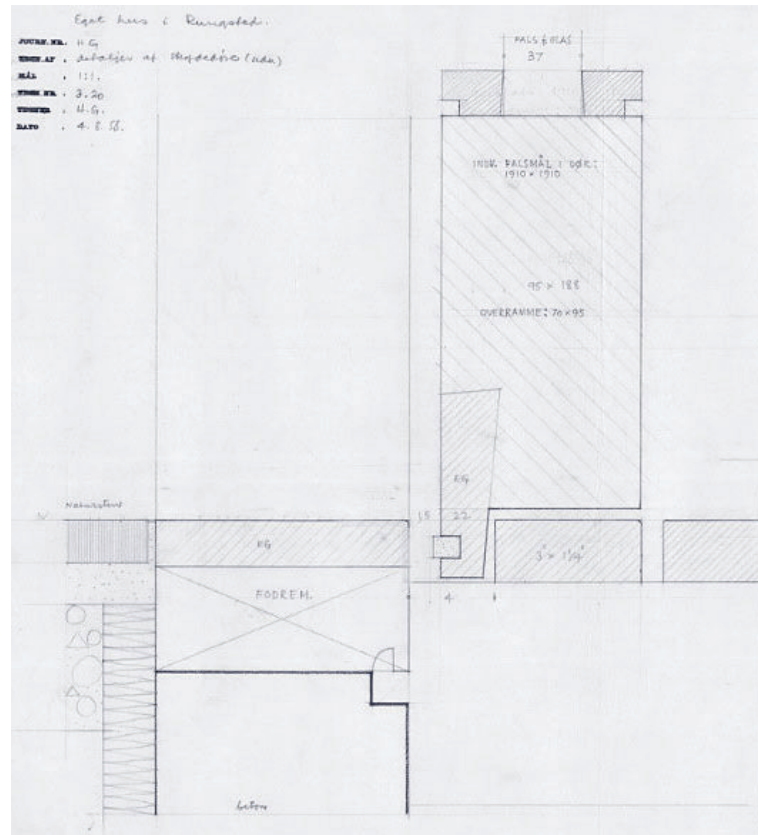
Details of sliding glass door: customized timber frames and Thermopane™ double glazing.
